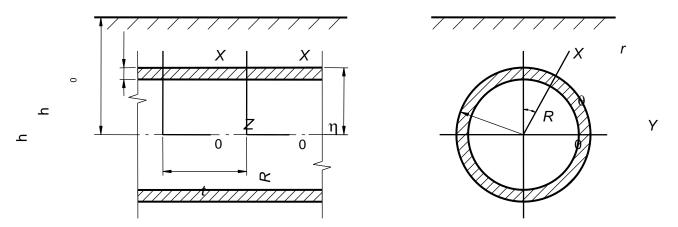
Design diagram of the reinforced tunnel and underground pipeline
